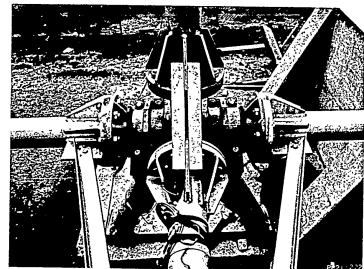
Rear support fitting shown made up with yokes bolted to saddle. Steel cables are temporary rigging.
